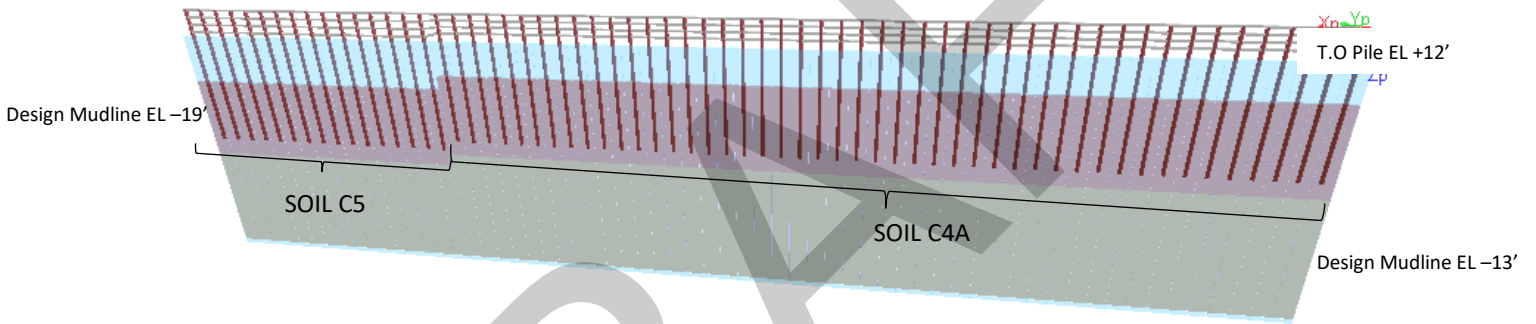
Section 4 Fender Layout –Soil Profile C4 & C5
